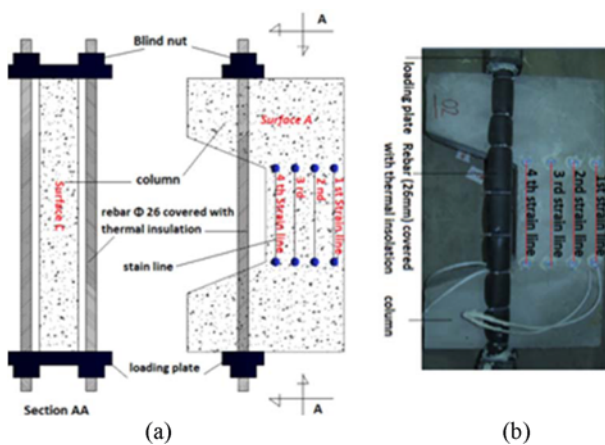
Application of Eccentric Sustained Load on the Column and Thermal Insulation Protection: (a) Application of Eccentric Load on the Column, (b) Thermal Insulation of Loading Bar
